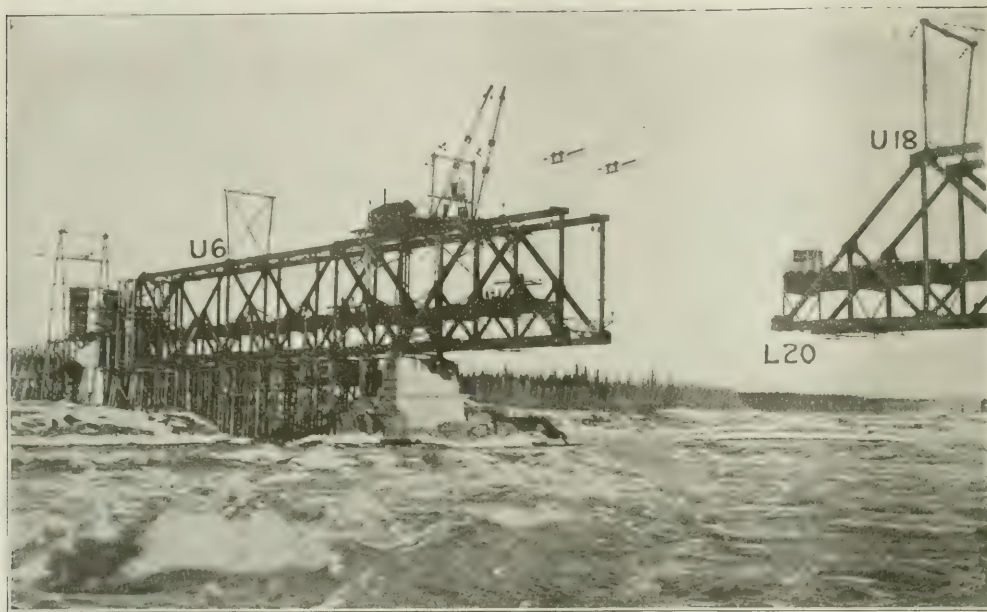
KETTLE RAPIDS BRIDGE, NORTH HALF CANTILEVERED OUT BY TOP-CHORD DERRICK TRAVELER SUPPLIED WITH MATERIAL FROM SOUTH BANK BY CABLEWAY
